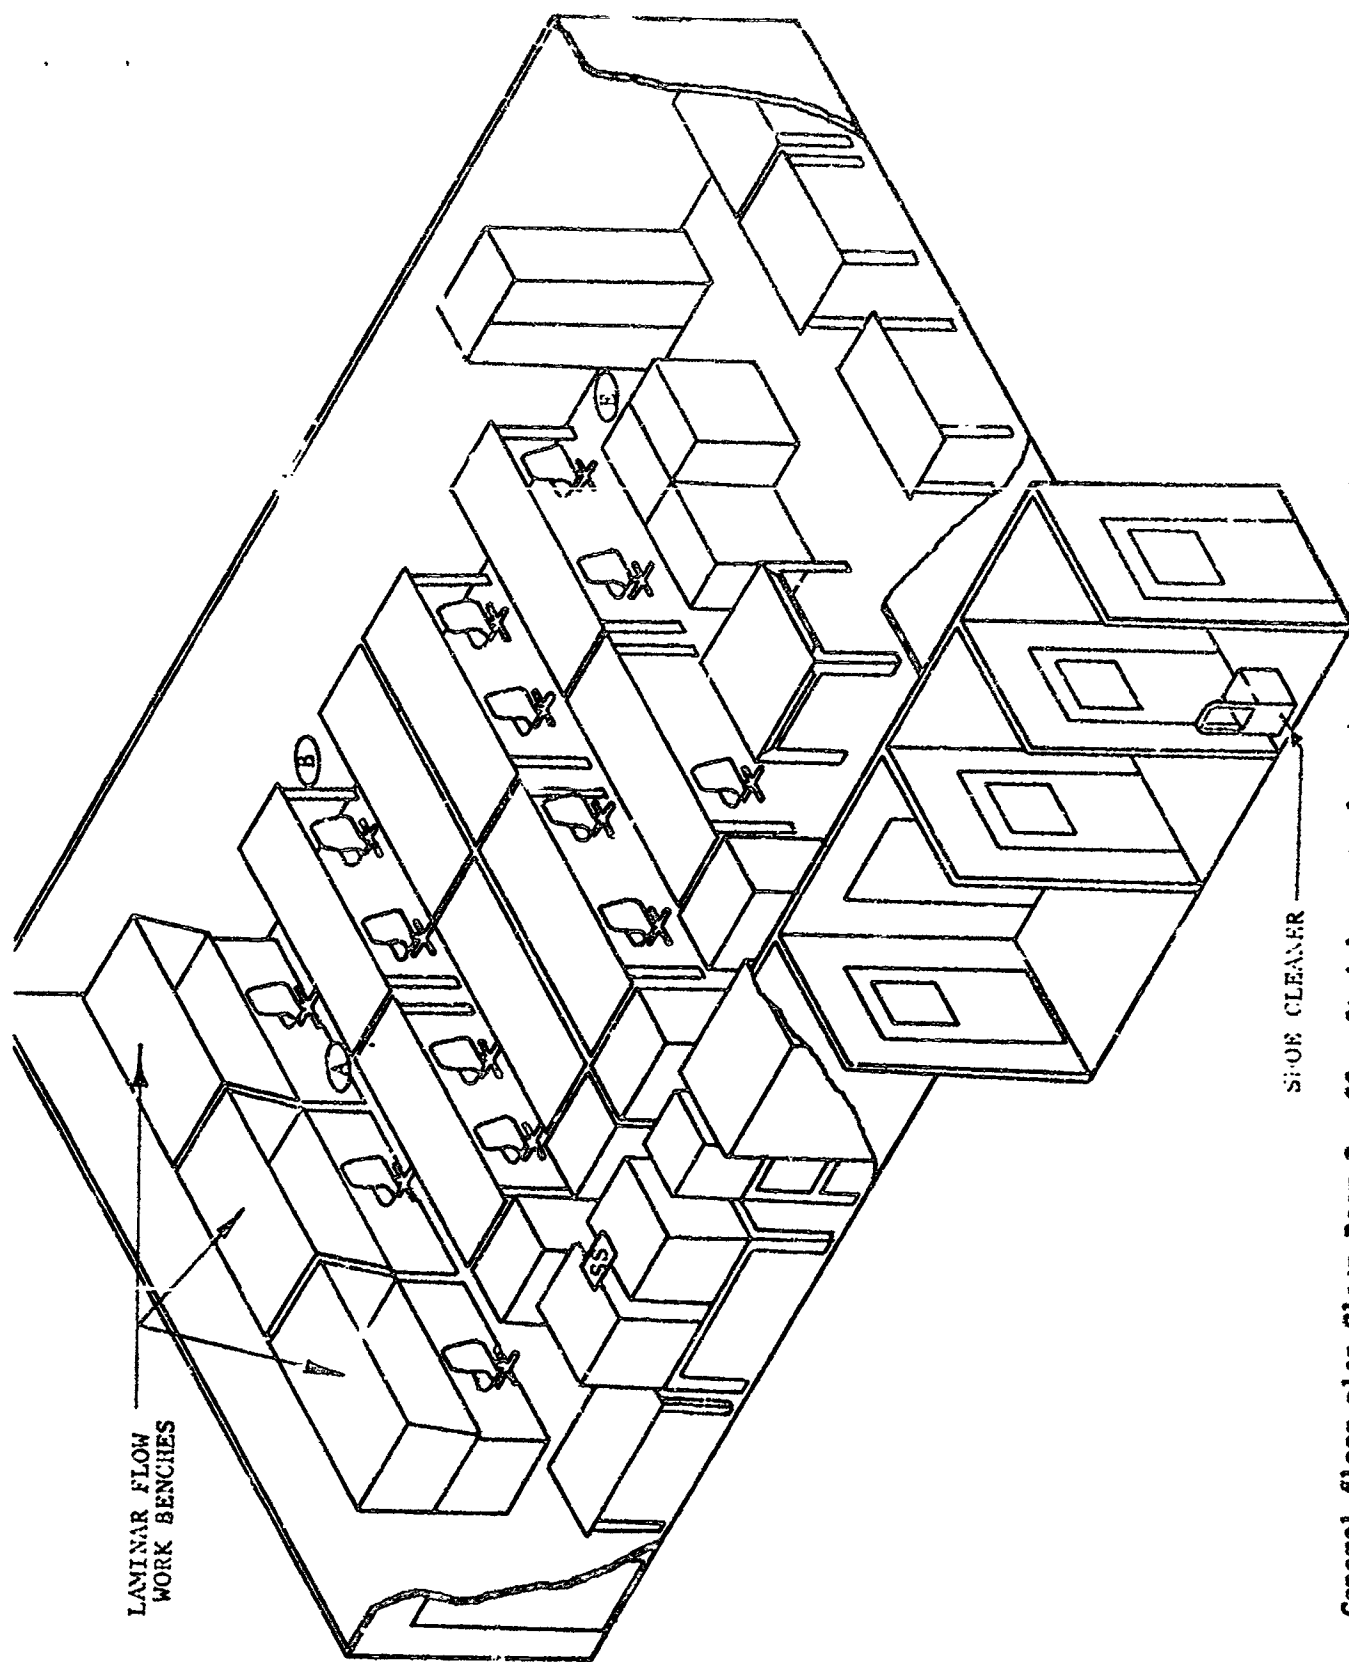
General floor plan Clean Room C. SS = Stainless steel strips; A, B, E = air sampling sites.
